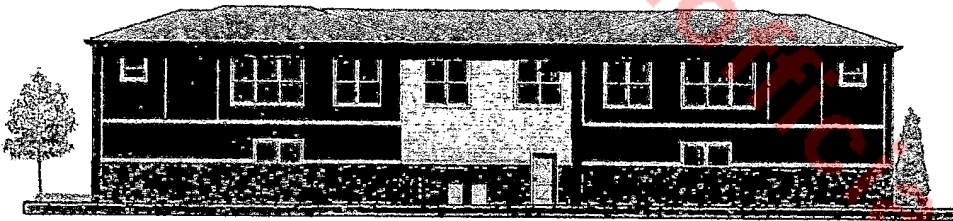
BUILDING 4,5 & 6 ELEVATIONS
